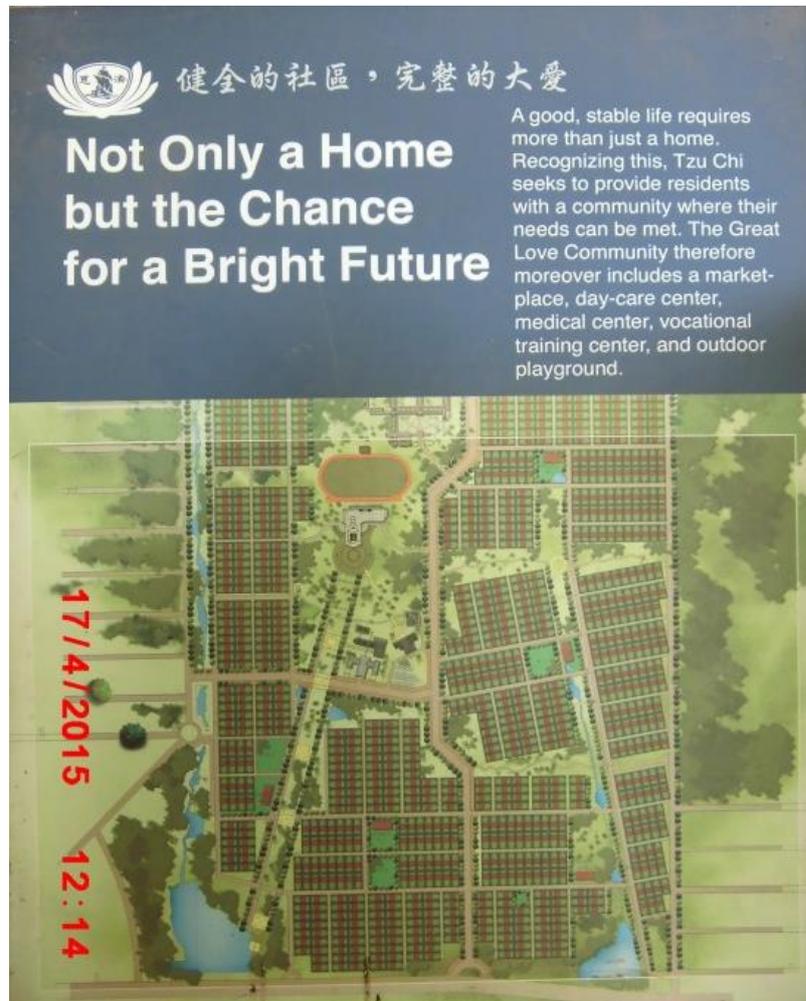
Layout plan of the TZUCHI village resettlement site Hambantota
